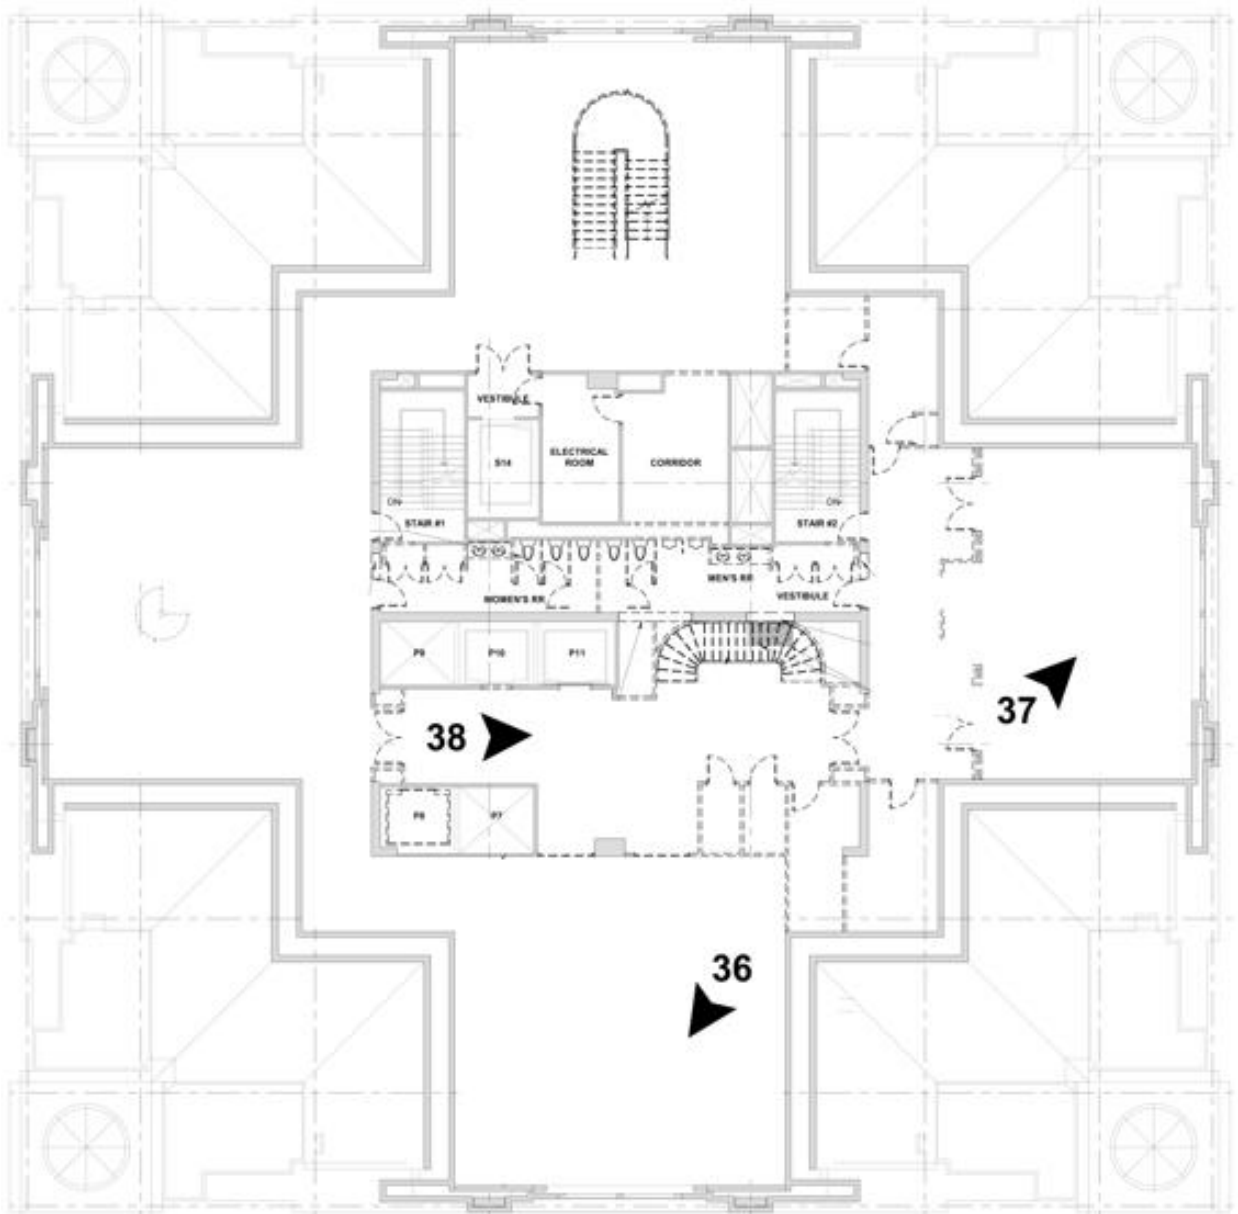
Thirty-fourth floor & photo plan. Base plan from SCB Architects, 2024
